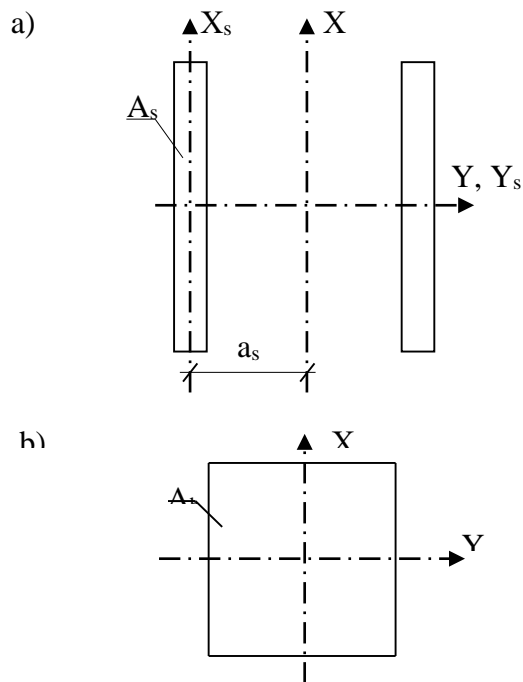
Scheme of cross-section of steel-reinforced concrete element with sheet reinforcement, with defined moments of inertia of component parts:
